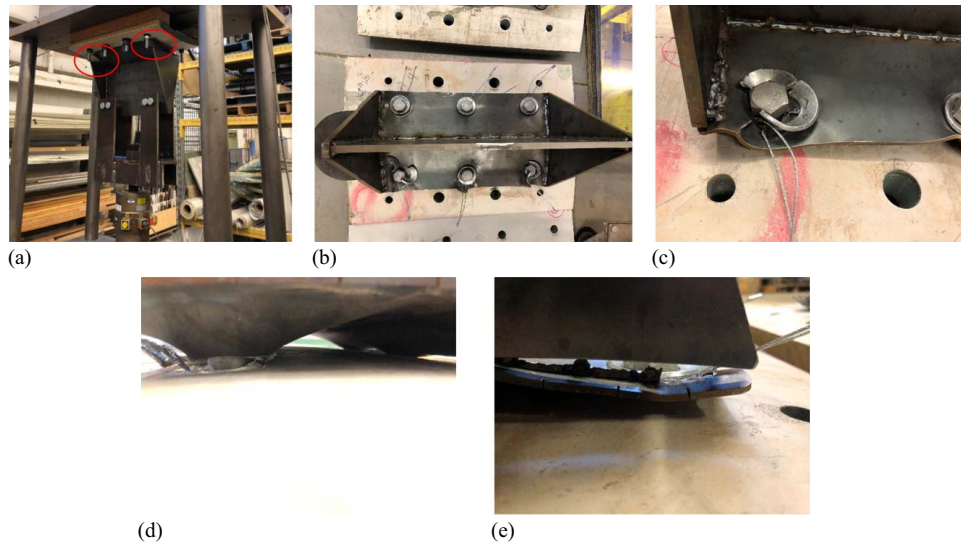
Failure of Type III blind bolt minor-axis specimen: (a) welding failure and excessive deflection; (b) bending of the stem and stiffener plates; and (c and d) welding failure and excessive bending of the base plate.
